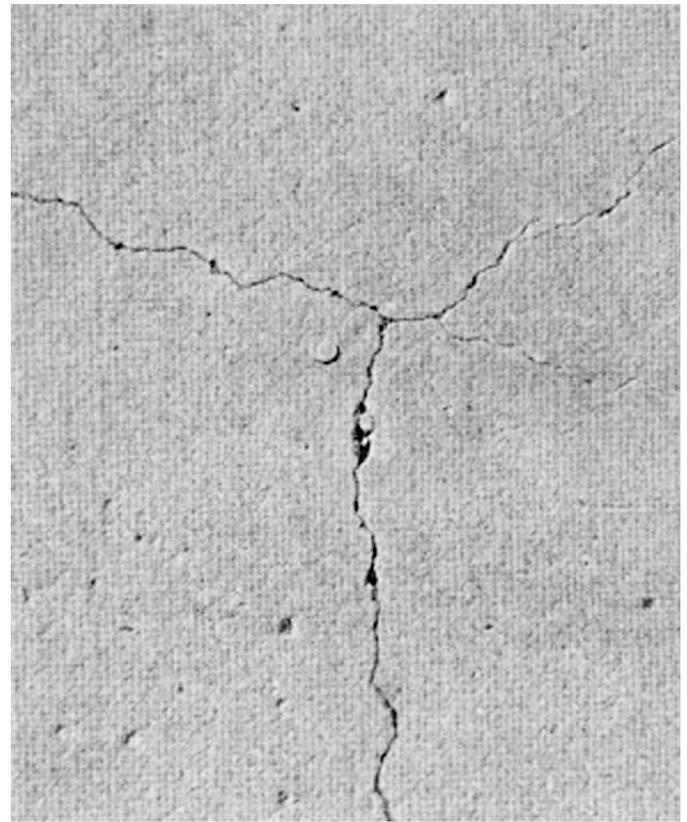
Drying-shrinkage cracks like these often result from improper joint spacing. (A5271)
